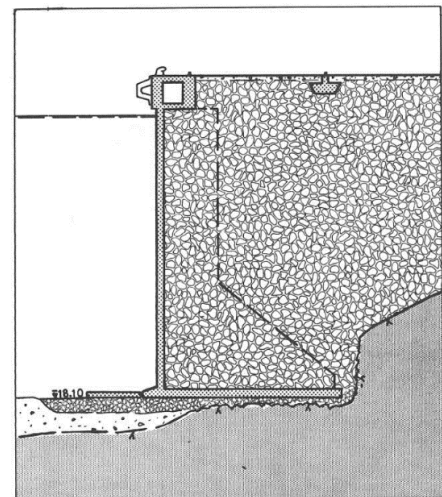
Inkoo quay wall cross-section (Pitkala, 1986)
